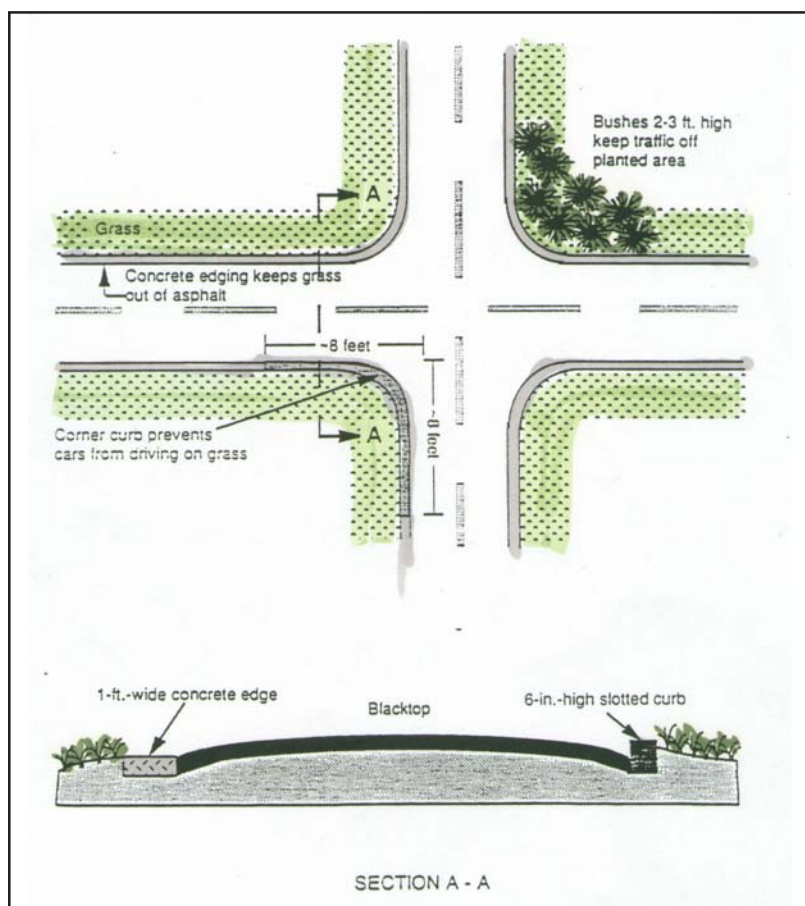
Example of Concrete Road Edging and Corner Curb (Roesner, ASCE, 1991)
